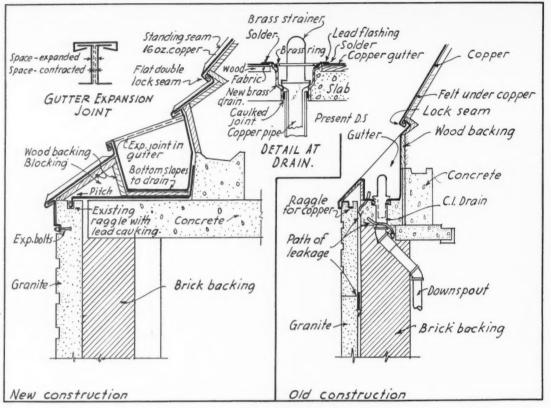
Old and new gutter construction at base of dome. Detail 1, Fig. 3—shows the location. Paths of water penetration are shown by arrows. New construction is completely different. Note, especially, the application of a through flashing sheet UNDER the gutter to drain any leakage. Also changes in drips and horizontal seams to provide additional places for movement between parts.
